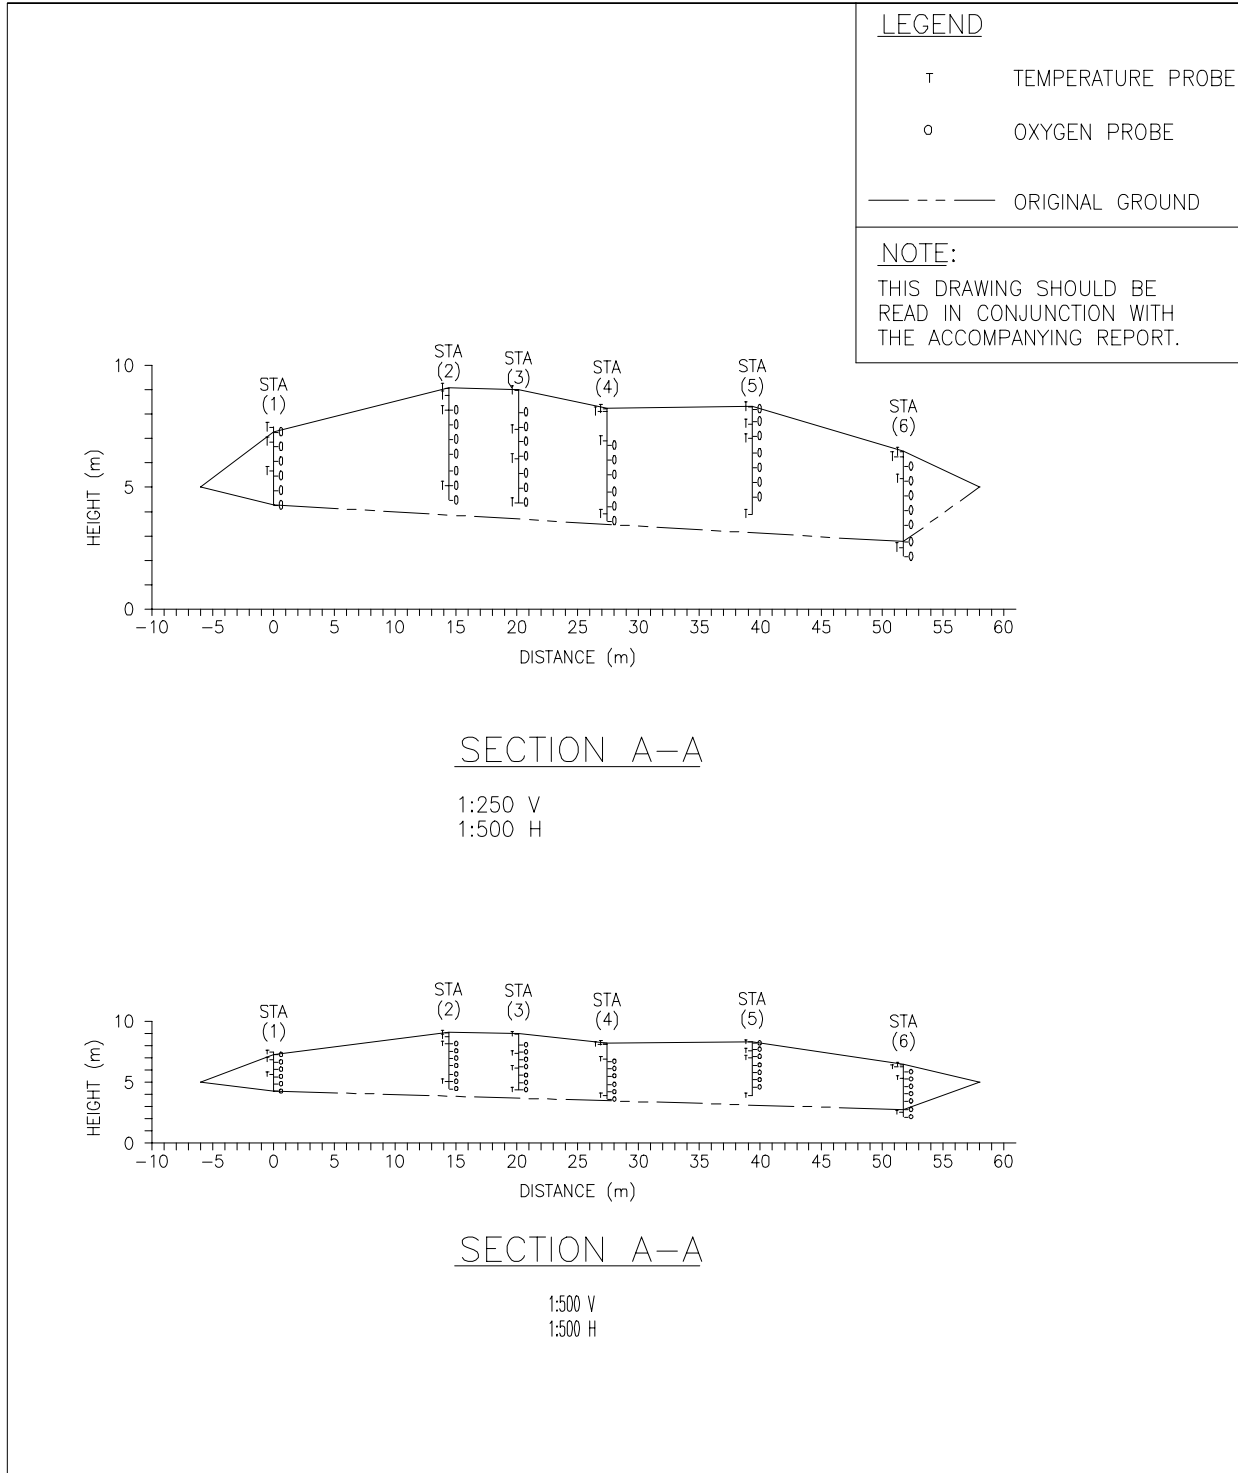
Cross-Section, Waste Rock Pile 18B
